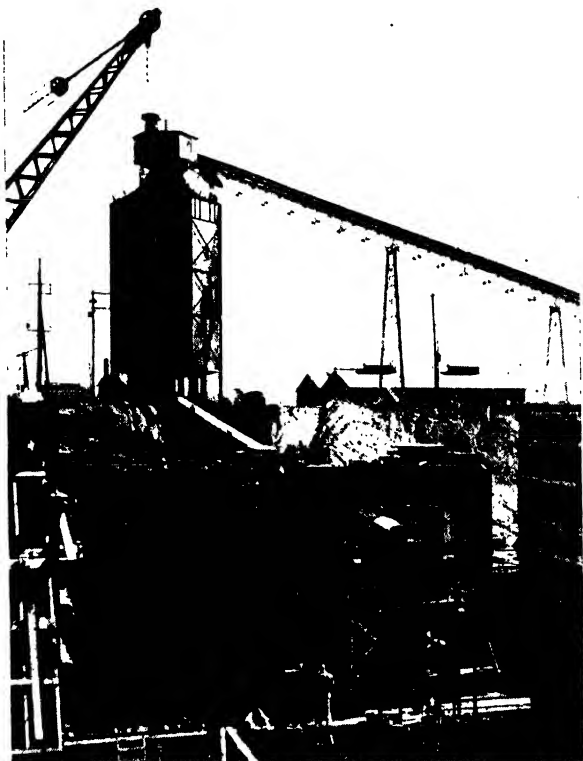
Belt conveyor delivers concrete from mixing plant to bucket loading hopper.
